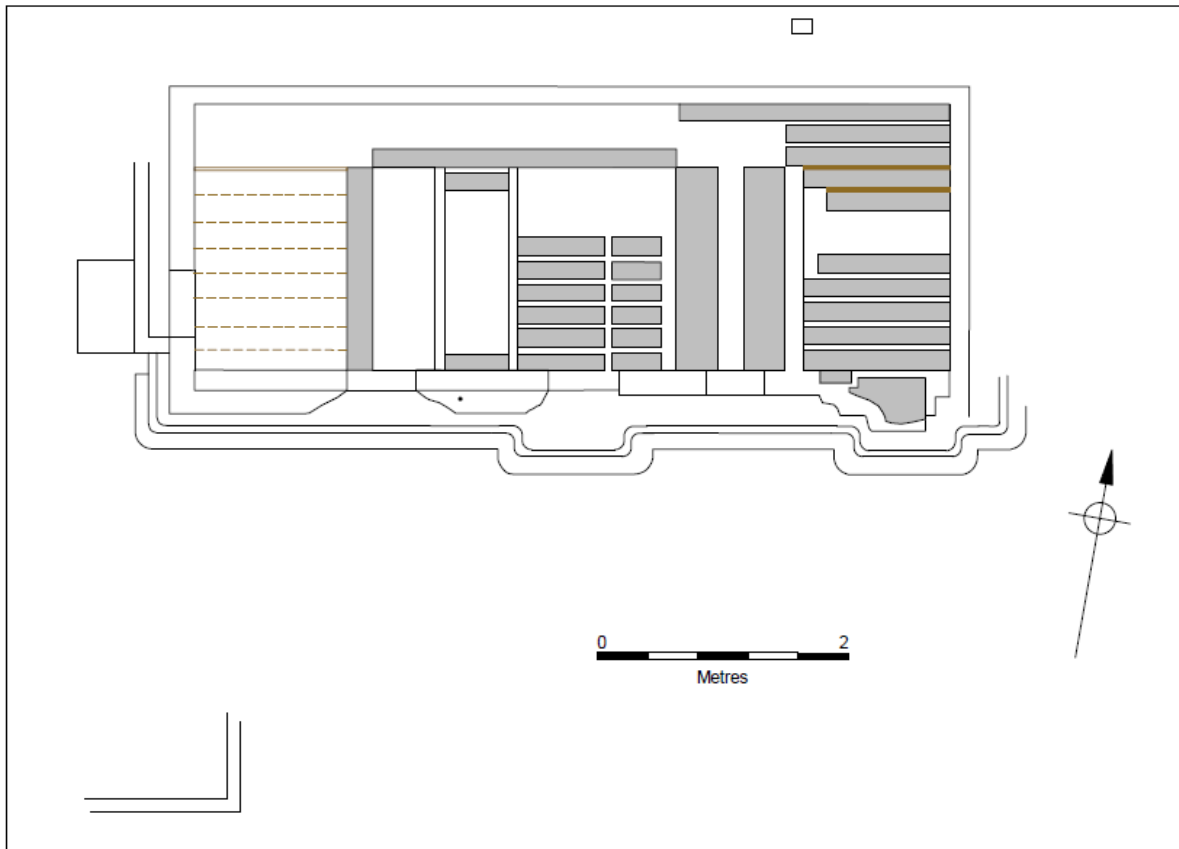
A 2011 measured survey of the foundations of the CHL station at Trewavas, showing its floor arrangement, and the two bulges protruding from the plinth which would have sited buttresses supporting the radar array above the roof of the building. A small masonry plinth is set on an outcrop to the south of the building.
